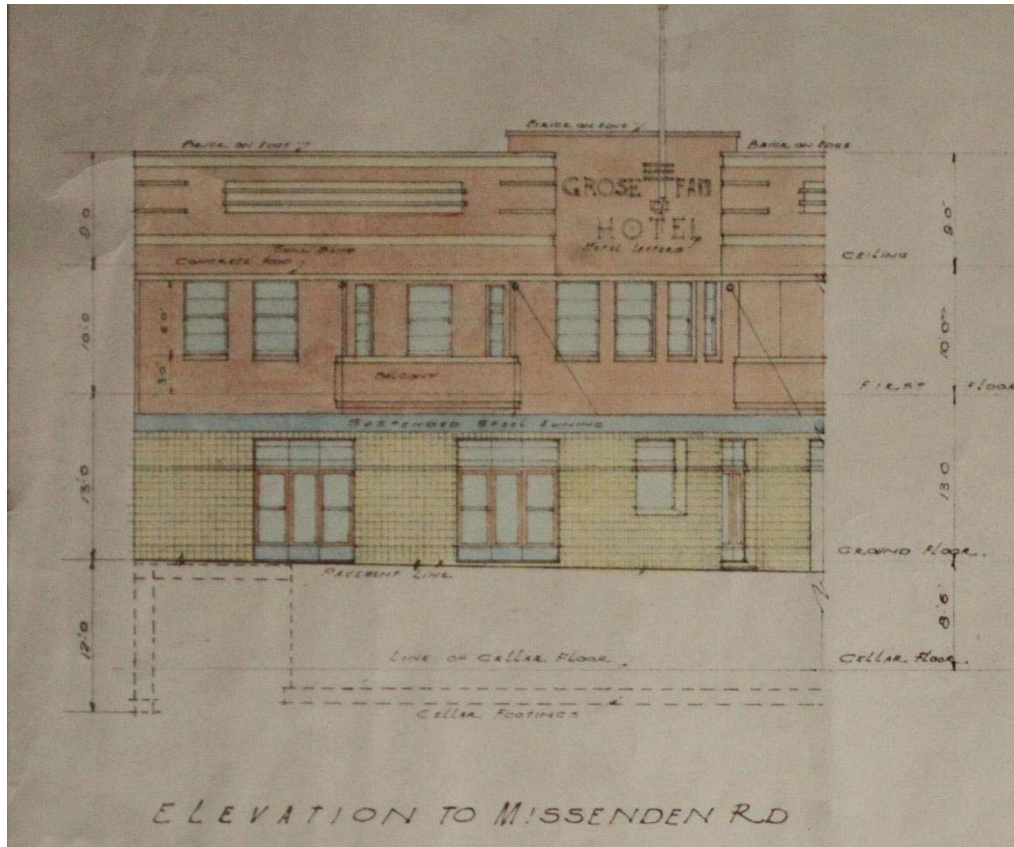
Extract from Building Application Plans comprising elevation to Missenden Road, 1939. (Source: City of Sydney Archives, BA 266/39)
